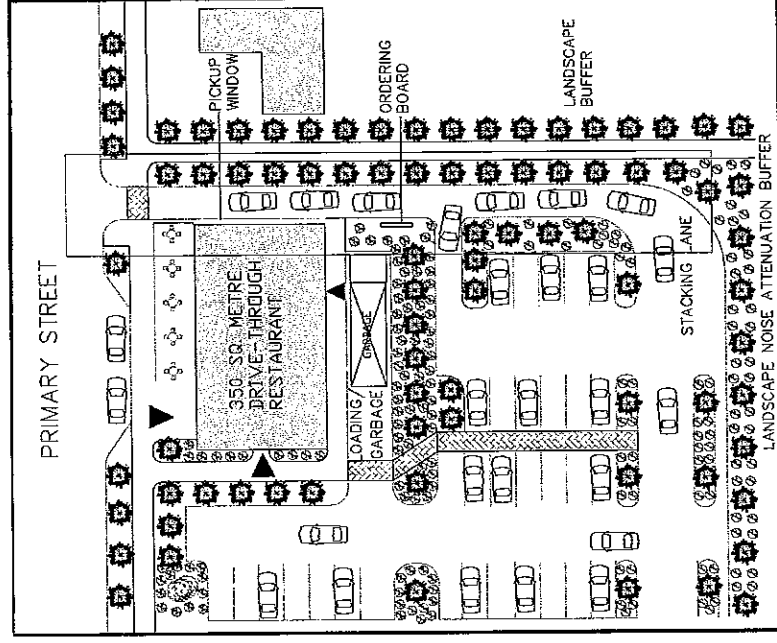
Stacking lanes should be located to the side or rear. Driveway access points should be minimized
